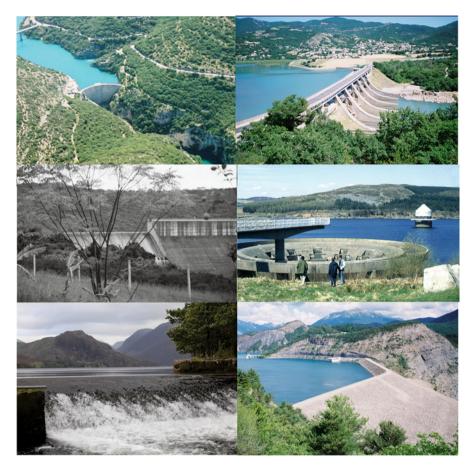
Some examples of types of dams and spillways; from *top left clockwise*: (a) arch dam, (b) run-of-river hydropower scheme, (c) bellmouth spillway, (d) earth-fill dam with side tunnel outlets for hydropower generation and flood relief, (e) weir at lake outlet, (f) gravity dam with overflow spillway
